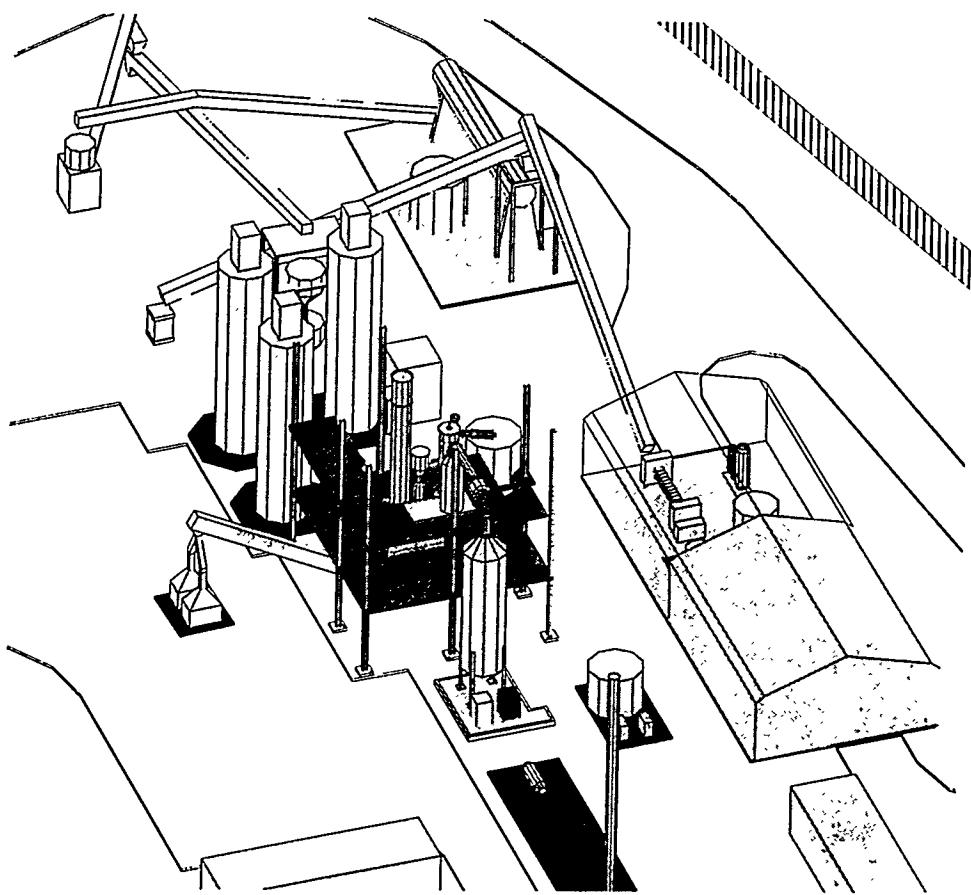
Isometric Drawing of Plant Arrangement
